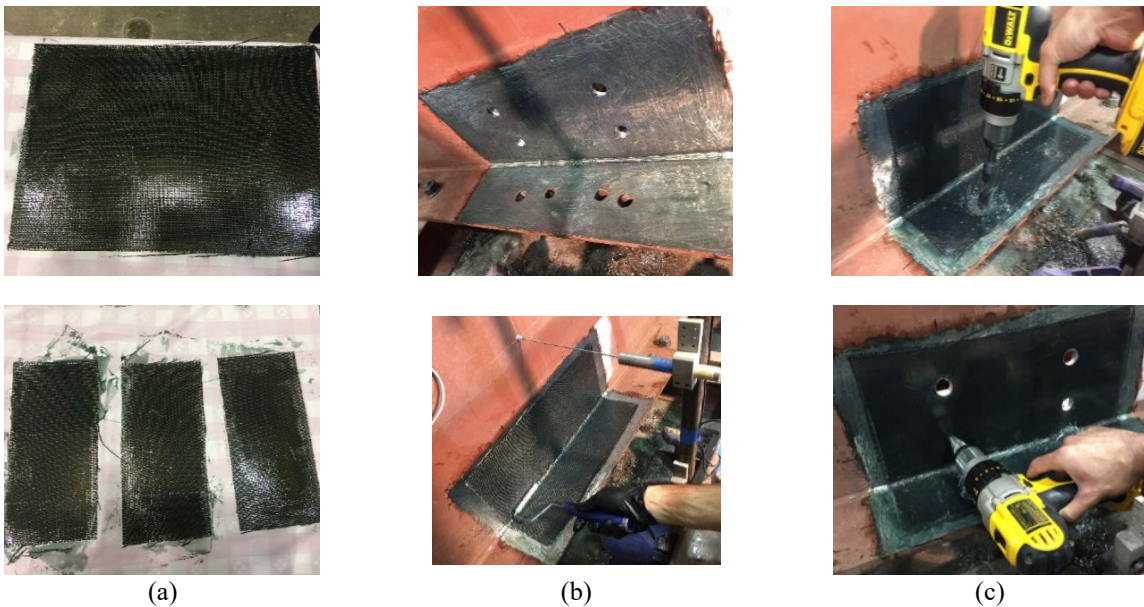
Application of the CFRP to the steel girder: (a) CFRP saturation; (b) CFRP application; (c) hole drilling
